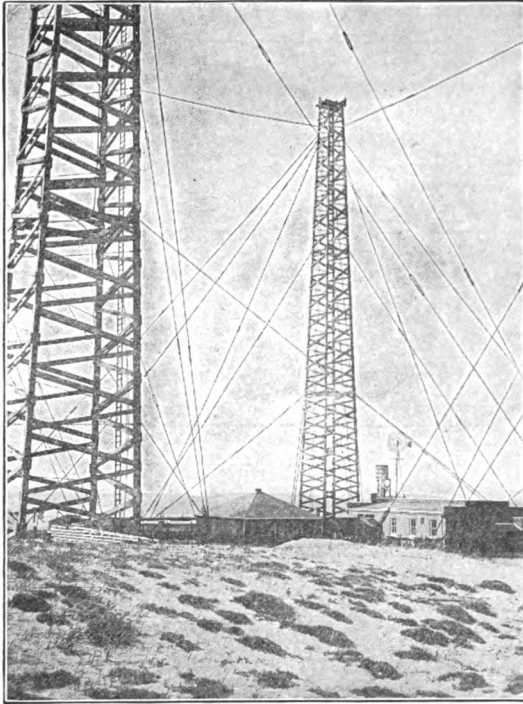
MARCONI SOUTH WELFLEET TOWERS UNDER CONSTRUCTION.
